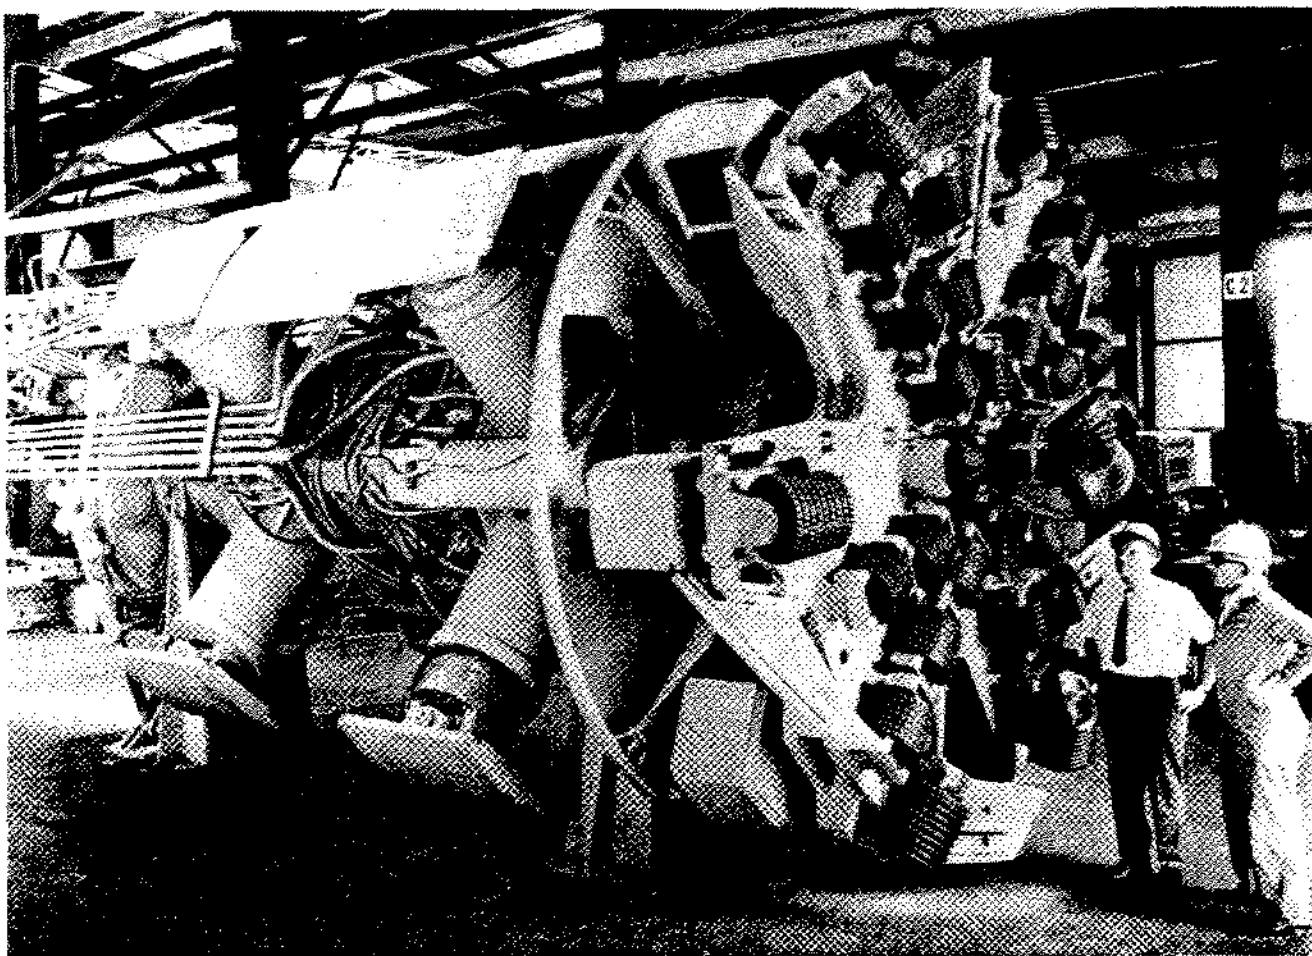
13 ft. Diam. Calweld Hard Rock Tunnel Borer.
